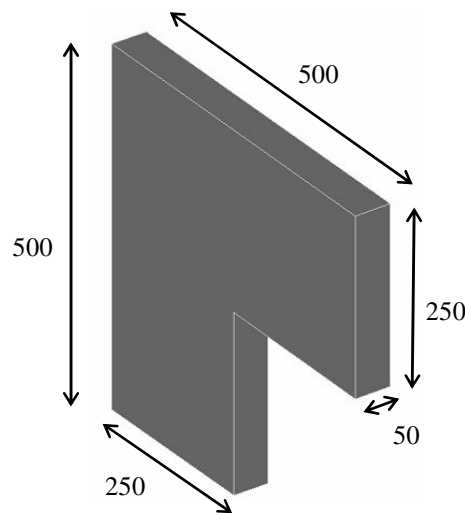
Geometry and dimensions of the L-shaped concrete specimen (all in mm).
